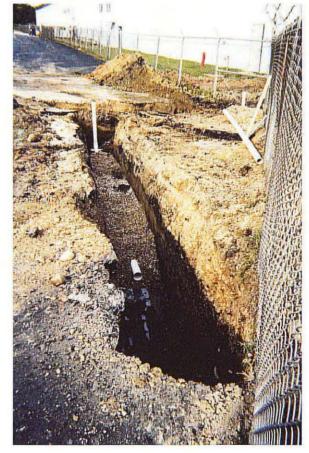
Looking north, picture of Trench 3. A 10-foot segment of perforated pipe has been placed, and the trench has been backfilled with pea gravel.
